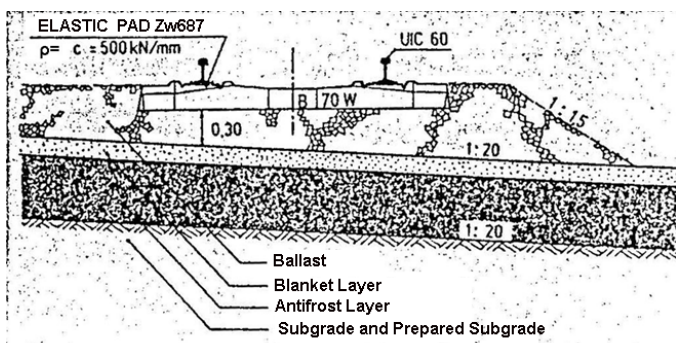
Ballasted Track with rails UIC60 and monoblock sleepers of prestressed concrete B70 type with W1 fastening with elastic pad Zw687 (Leykauf et al., 1990).
